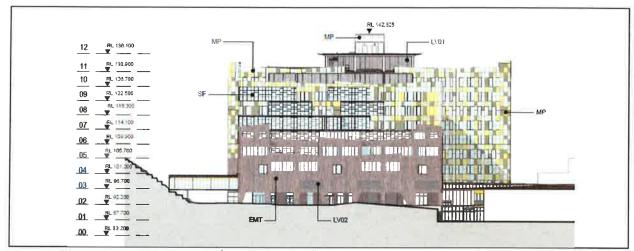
| Eastern elevation (Source: Applicant's RtS 2018)
